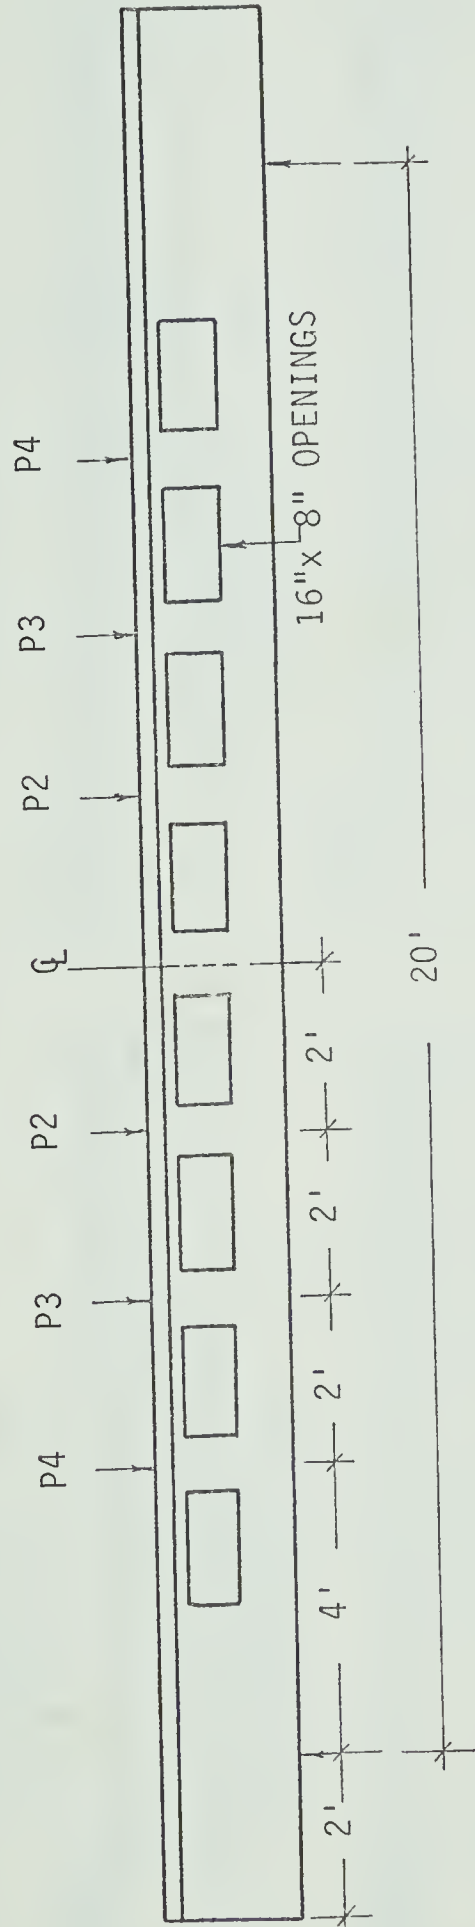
TYPICAL BEAM REINFORCEMENT DETAIL
